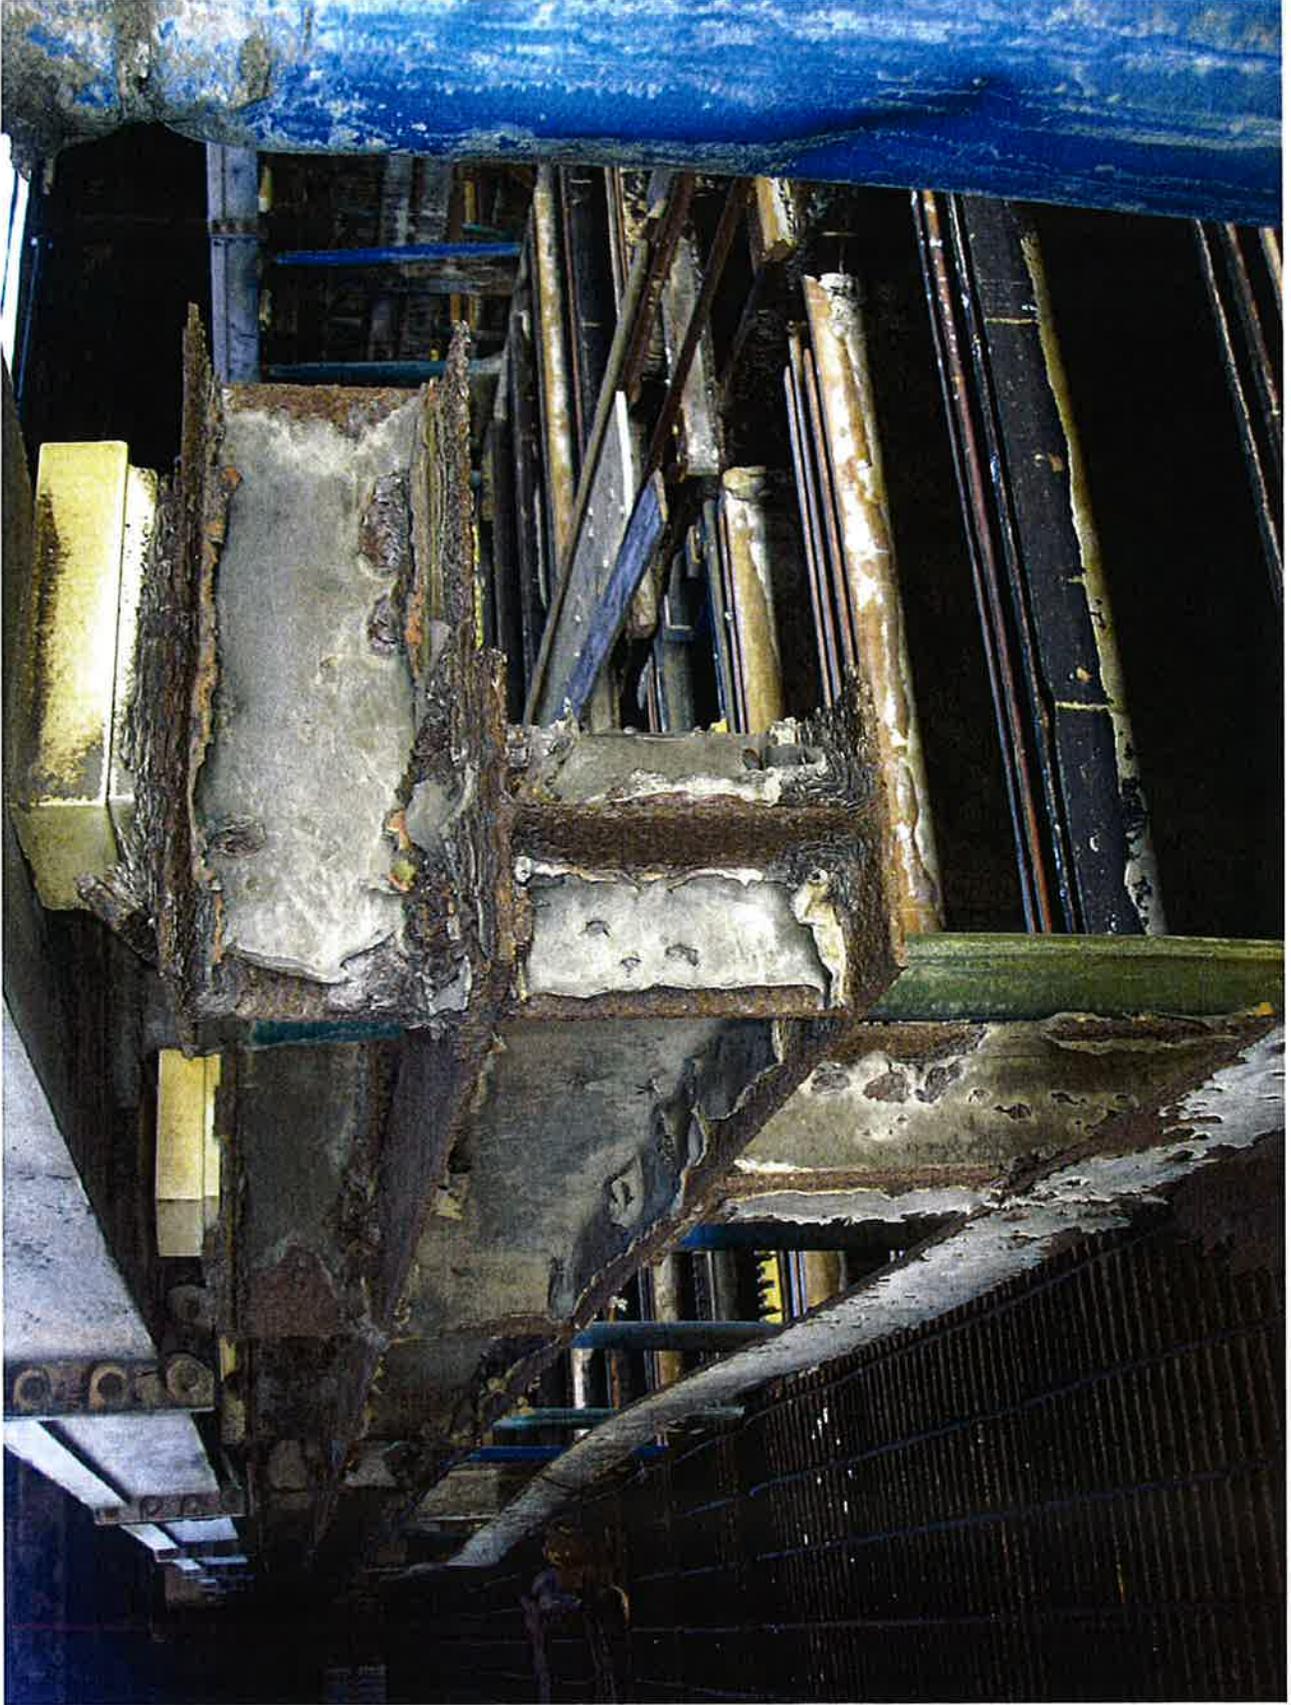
DETERIORATED CATWALK AT WEST HALF OF BUILDING 16
